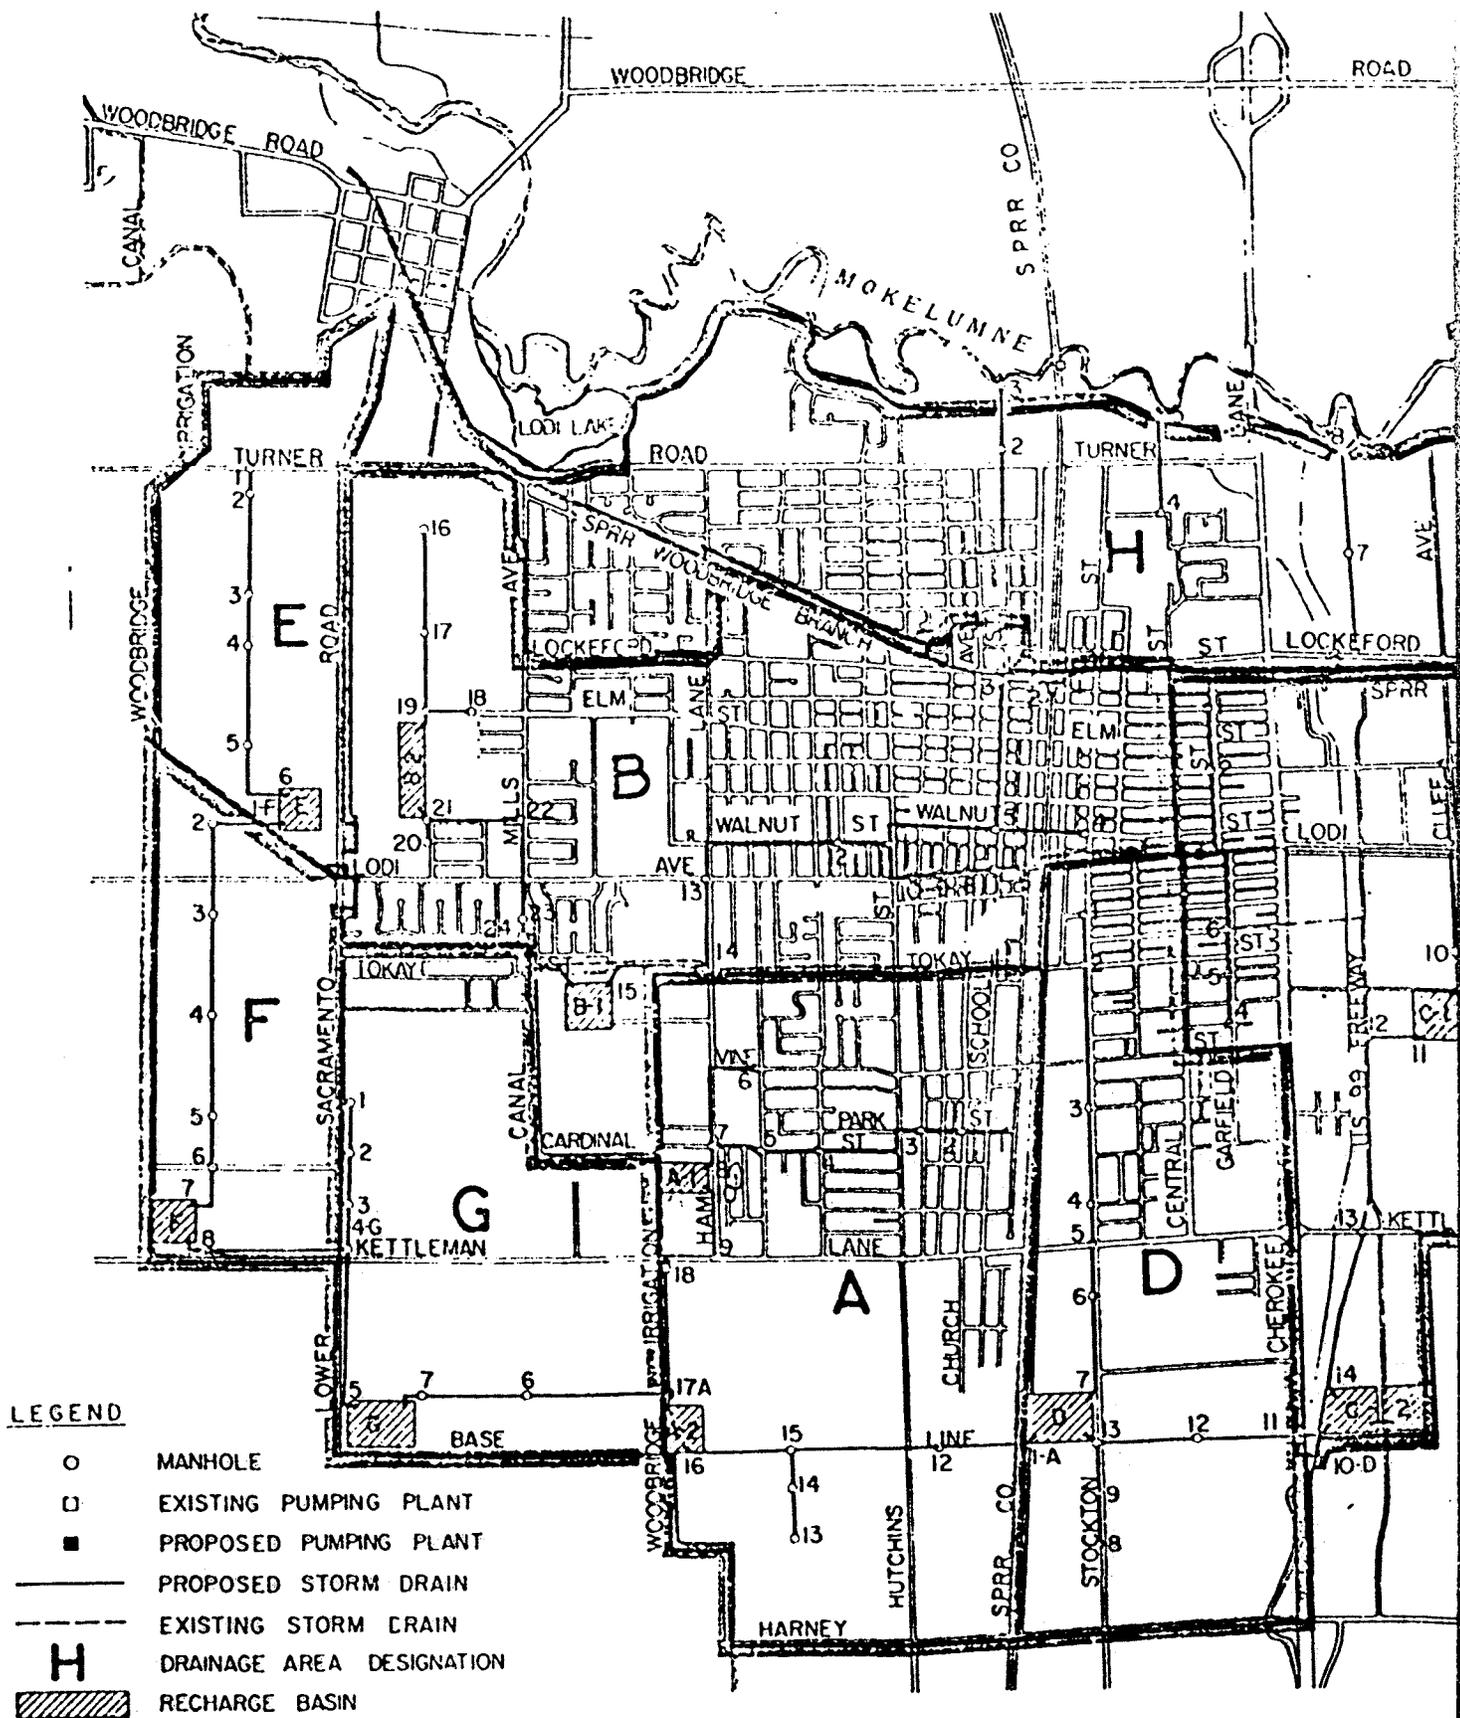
PROPOSED STORM DRAINAGE FAC
